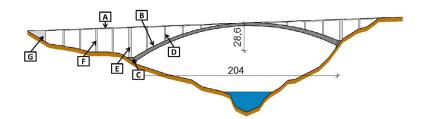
Elements in an Open Spandrel Concrete Arch
